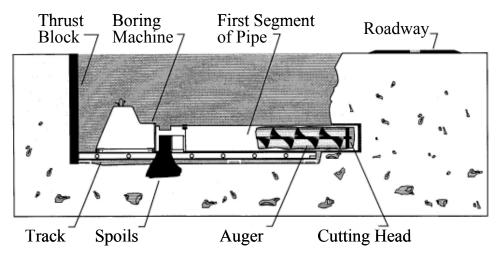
Typical Auger Boring Operation.⁽¹⁷⁾
